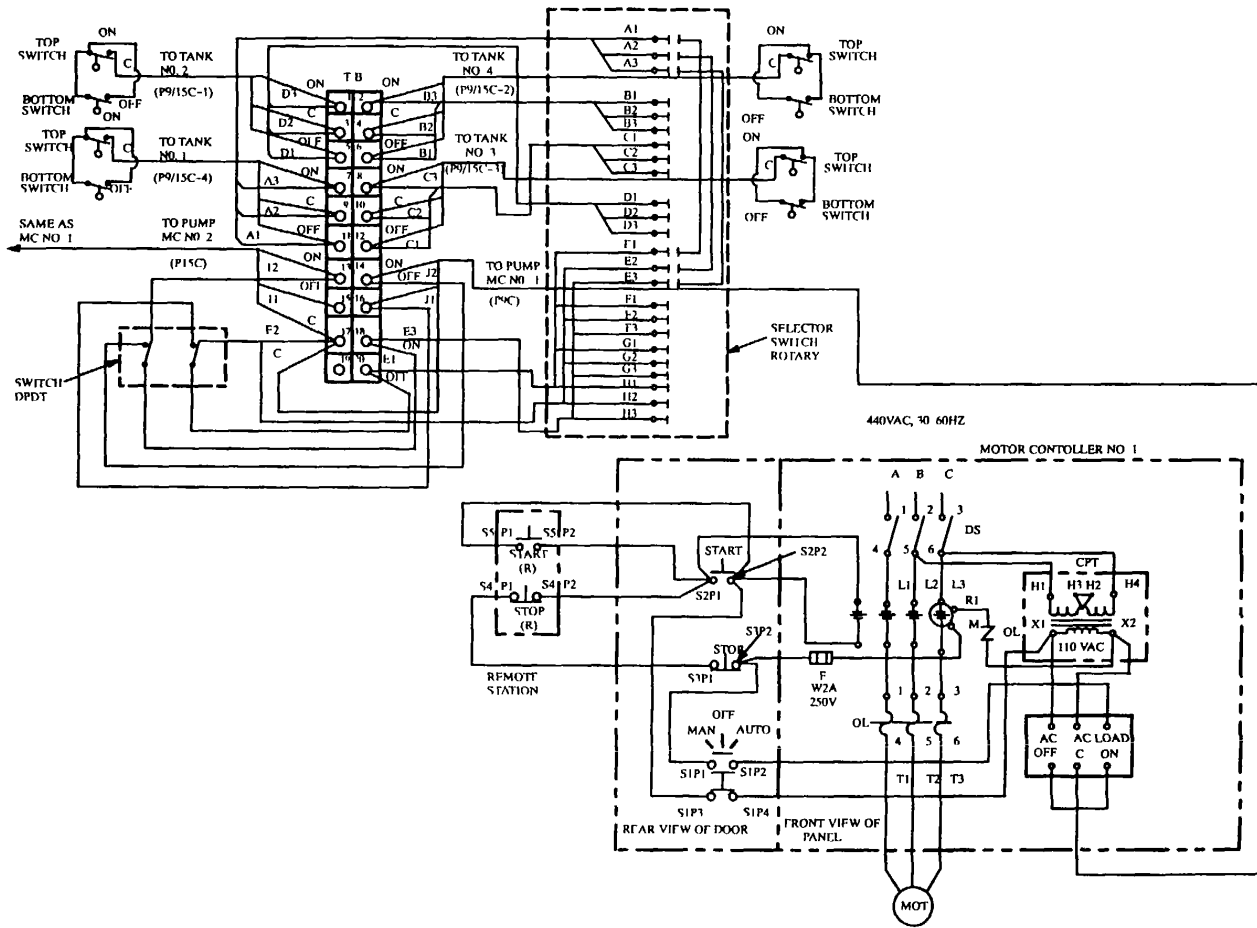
Drinking Water Discharge Pump No. 1 and No. 2 Motor Controllers, Tank Selector Switch, and Tank Top and Bottom Level Switches
